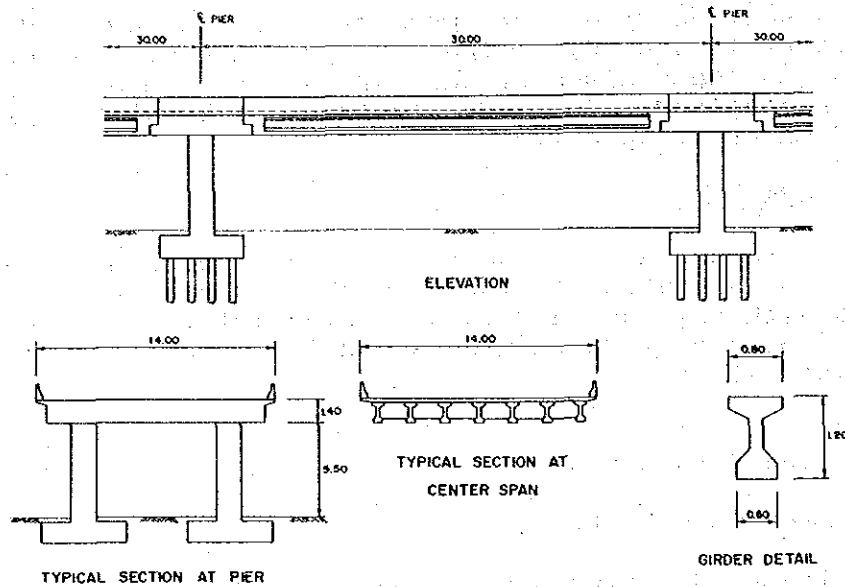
Typical Sections of Elevated Sections of Project Roads
